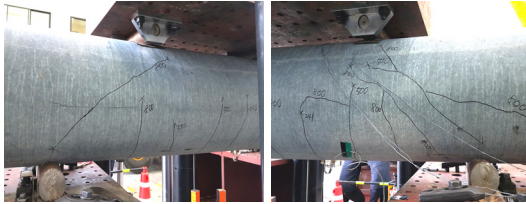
Concrete cracks in sample RC500-S-NJ
